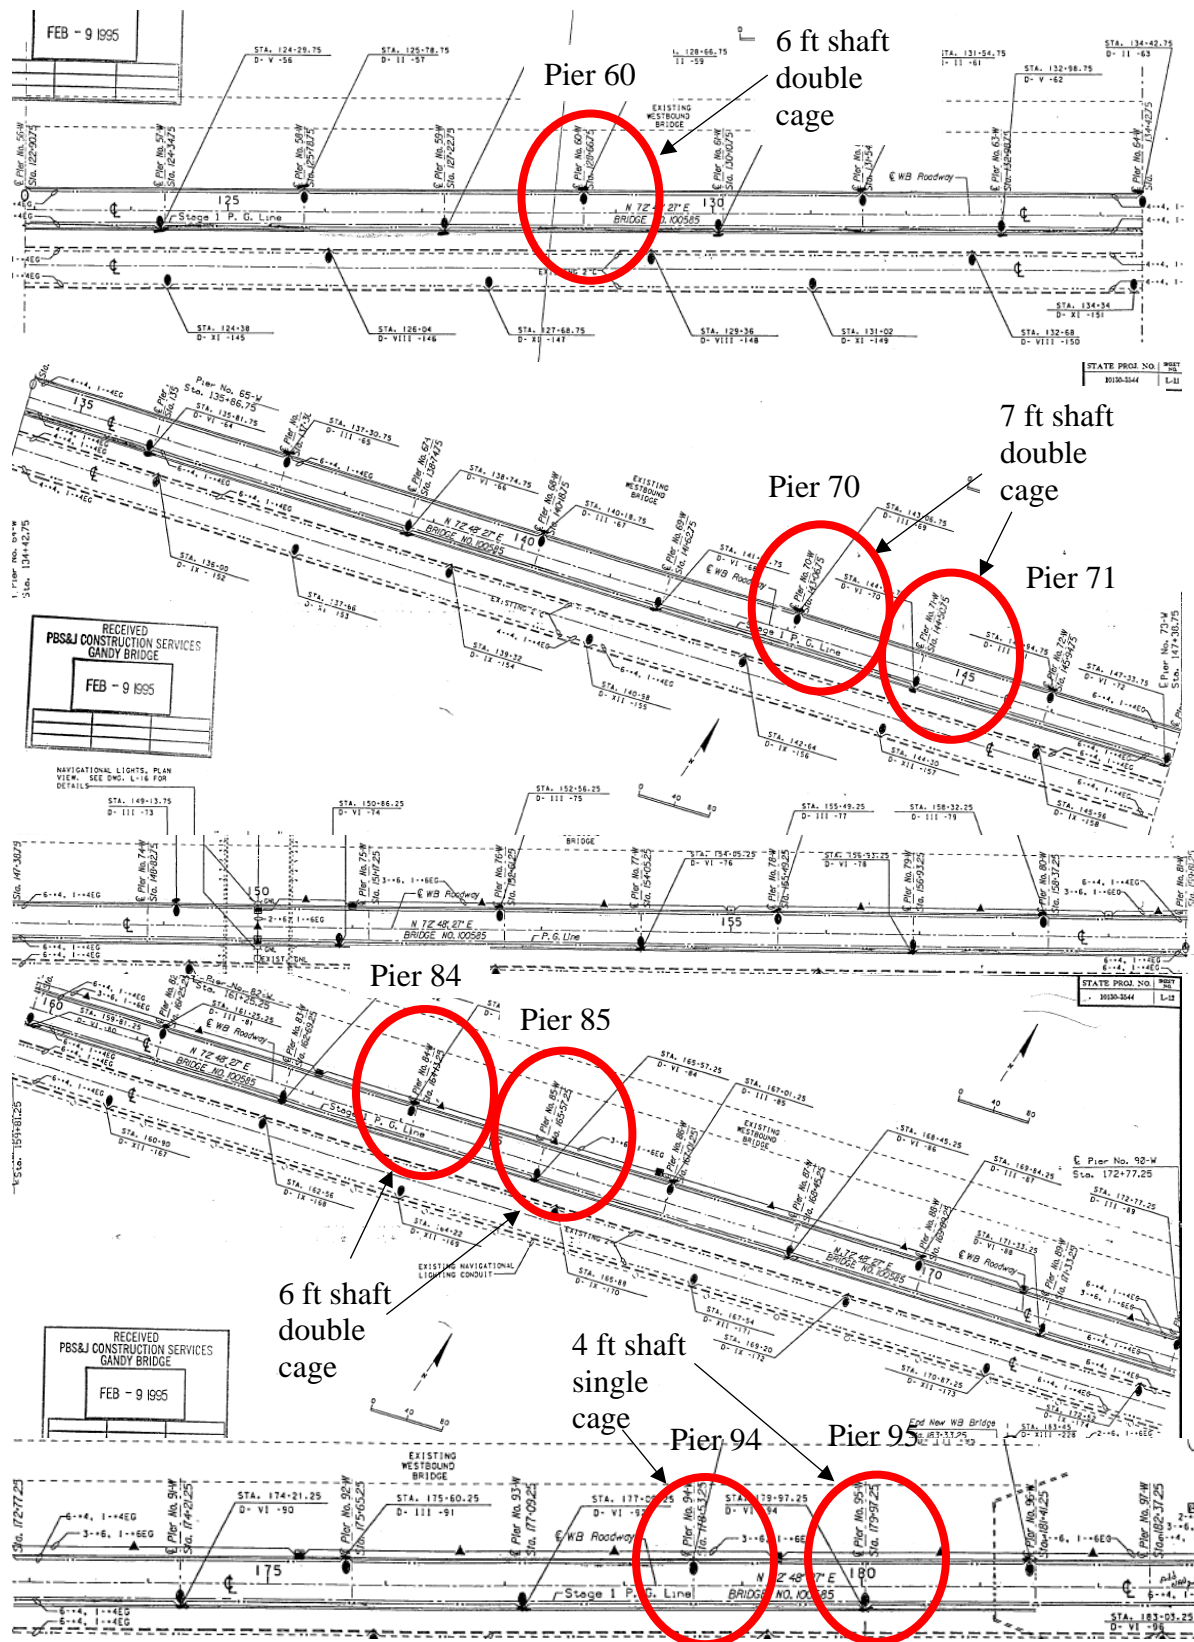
Plan view of eastern portion of Gandy Bridge. The piers that were inspected have been circled.
